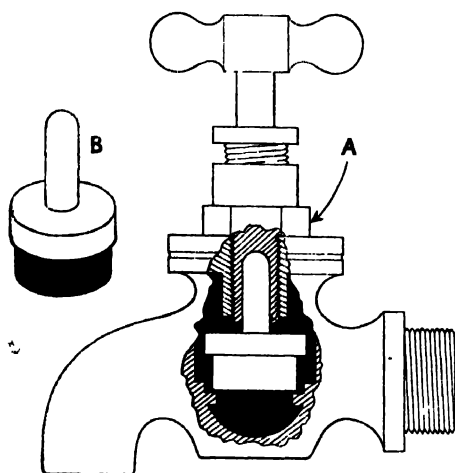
To re-washer a tap: (1) turn off water at main; (2) open tap to full extent; (3) unscrew spindle at point (A) and lift out; (4) lift out jumper, fit new washer on it at (B), and replace in position; (5) replace spindle and tighten up; (6) turn on water at main
